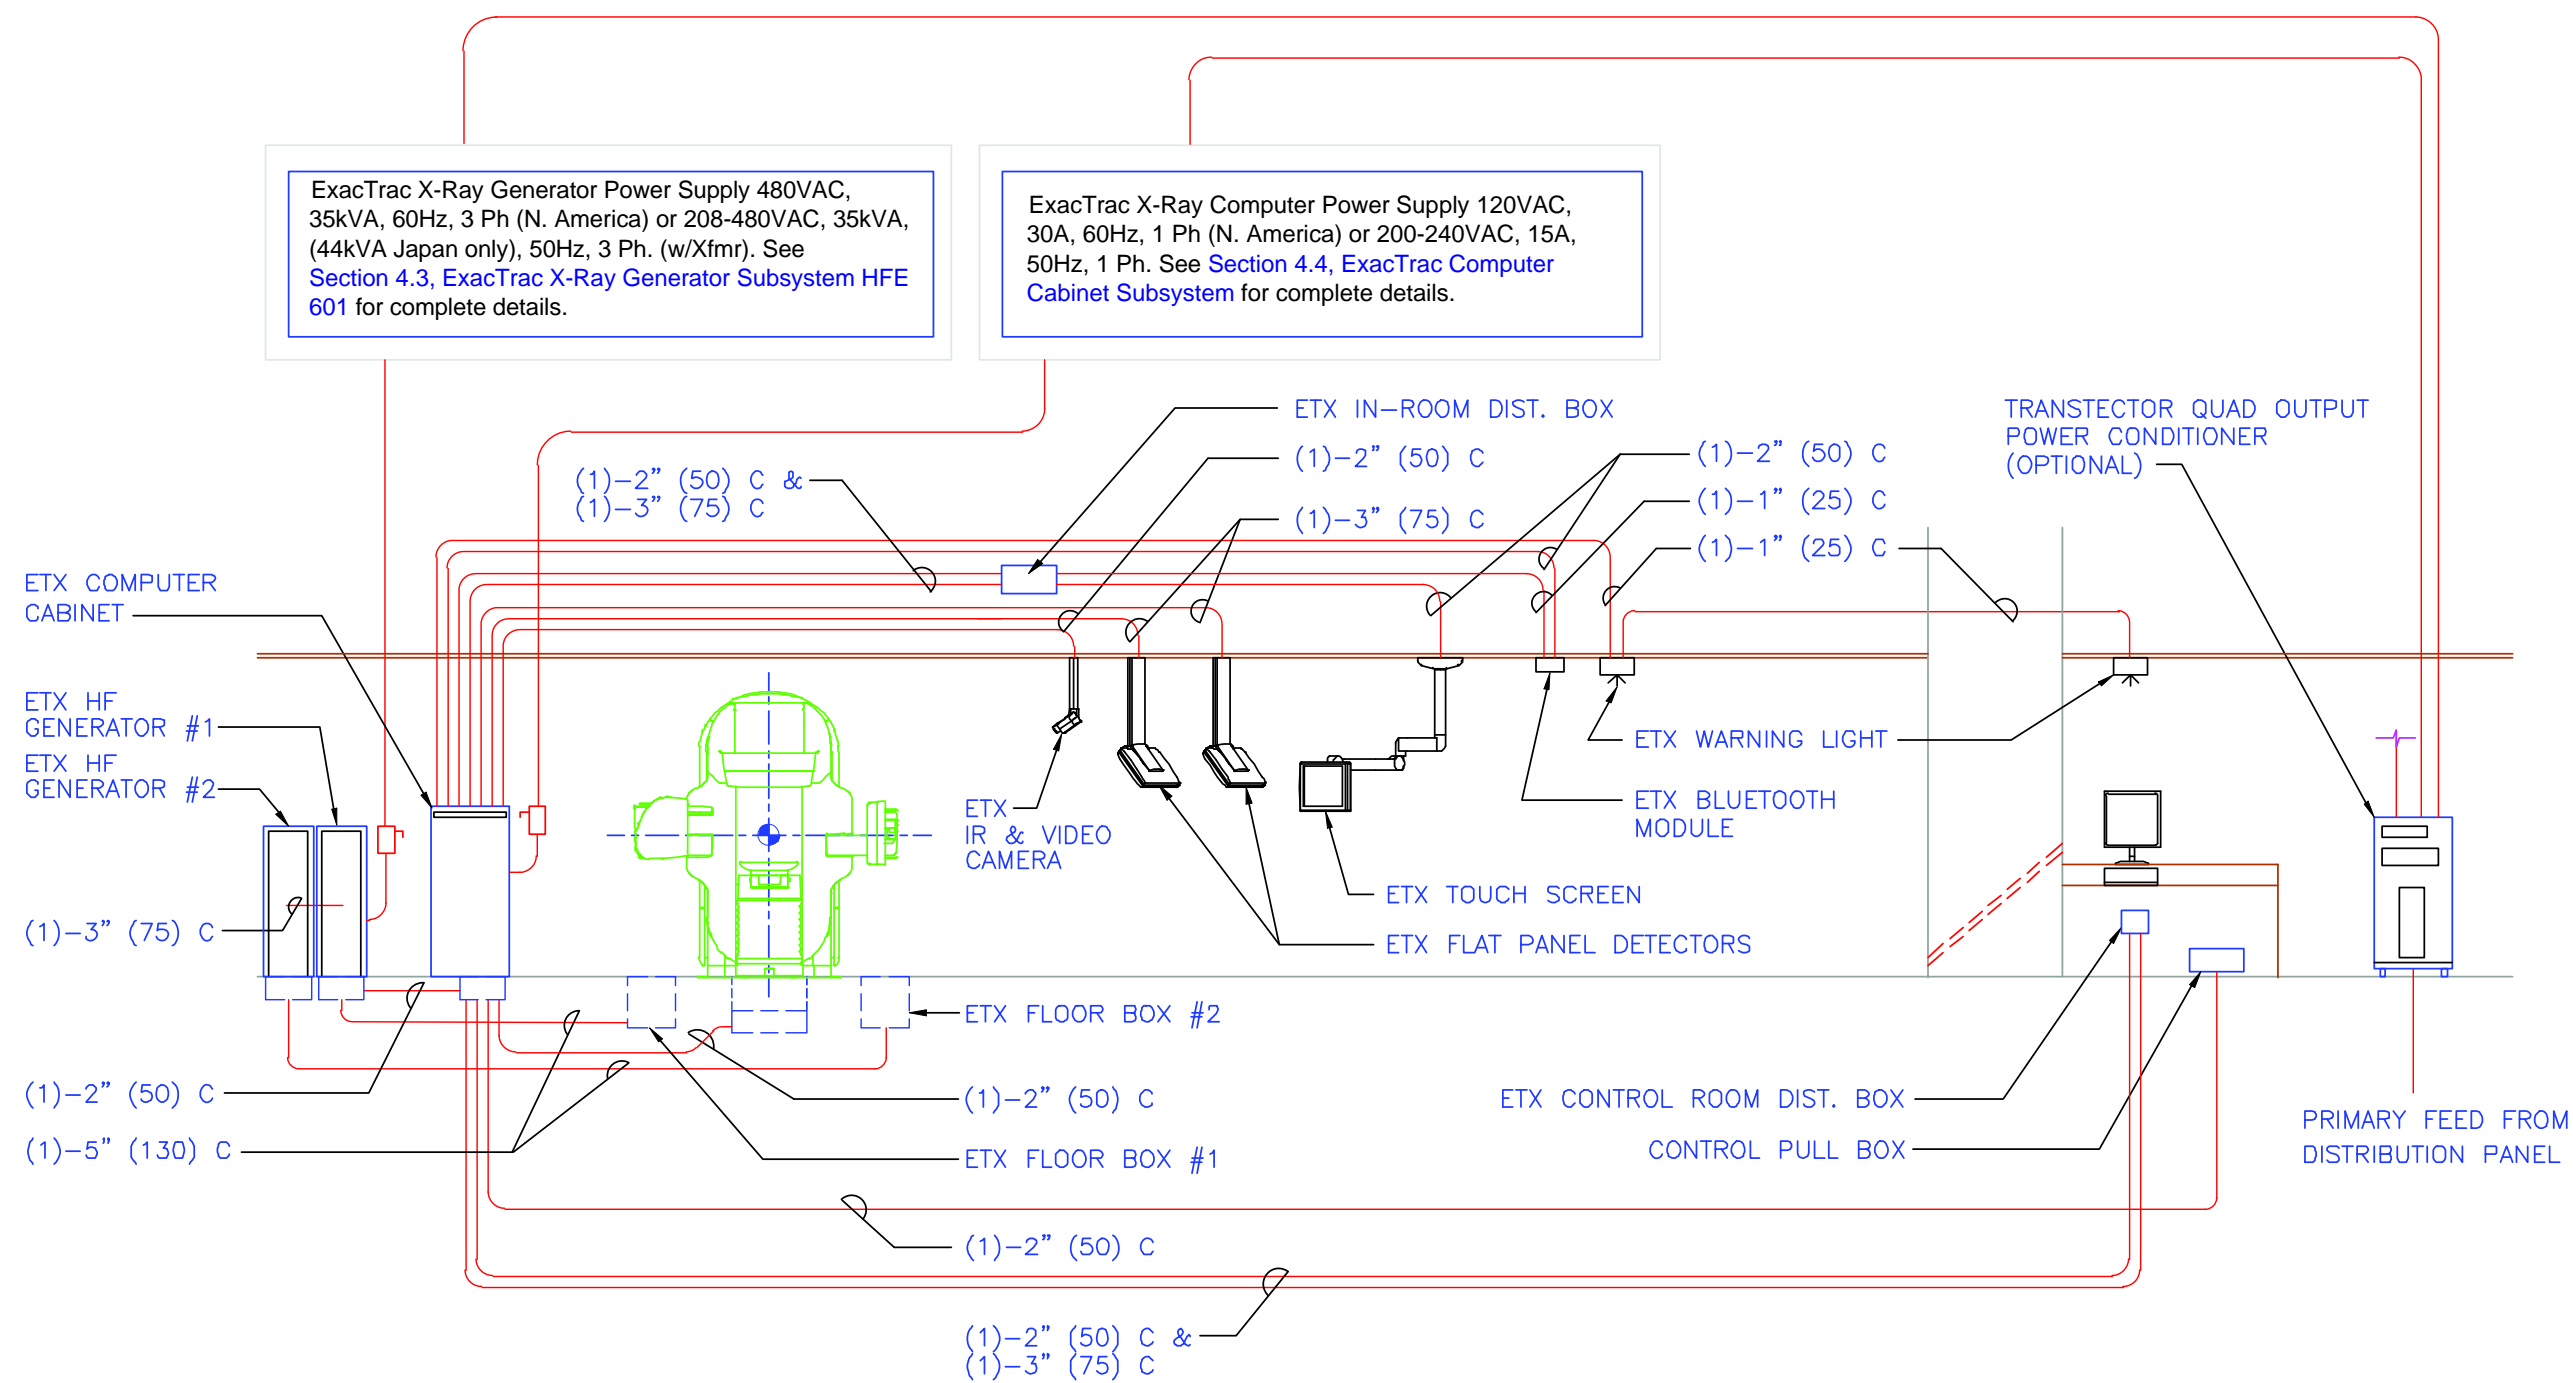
Typical ExacTrac Conduit Diagram (Plan View)
